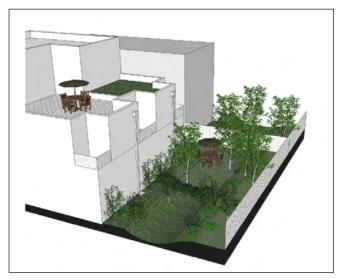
Minimize stormwater runoff to impermeable areas with landscaping, green roofs, and rain gardens when possible.
